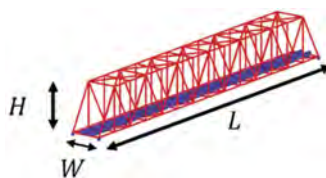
Railway bridge FE model. H: 7.7 m, L: 60.5 m and W: 5.25 m.
